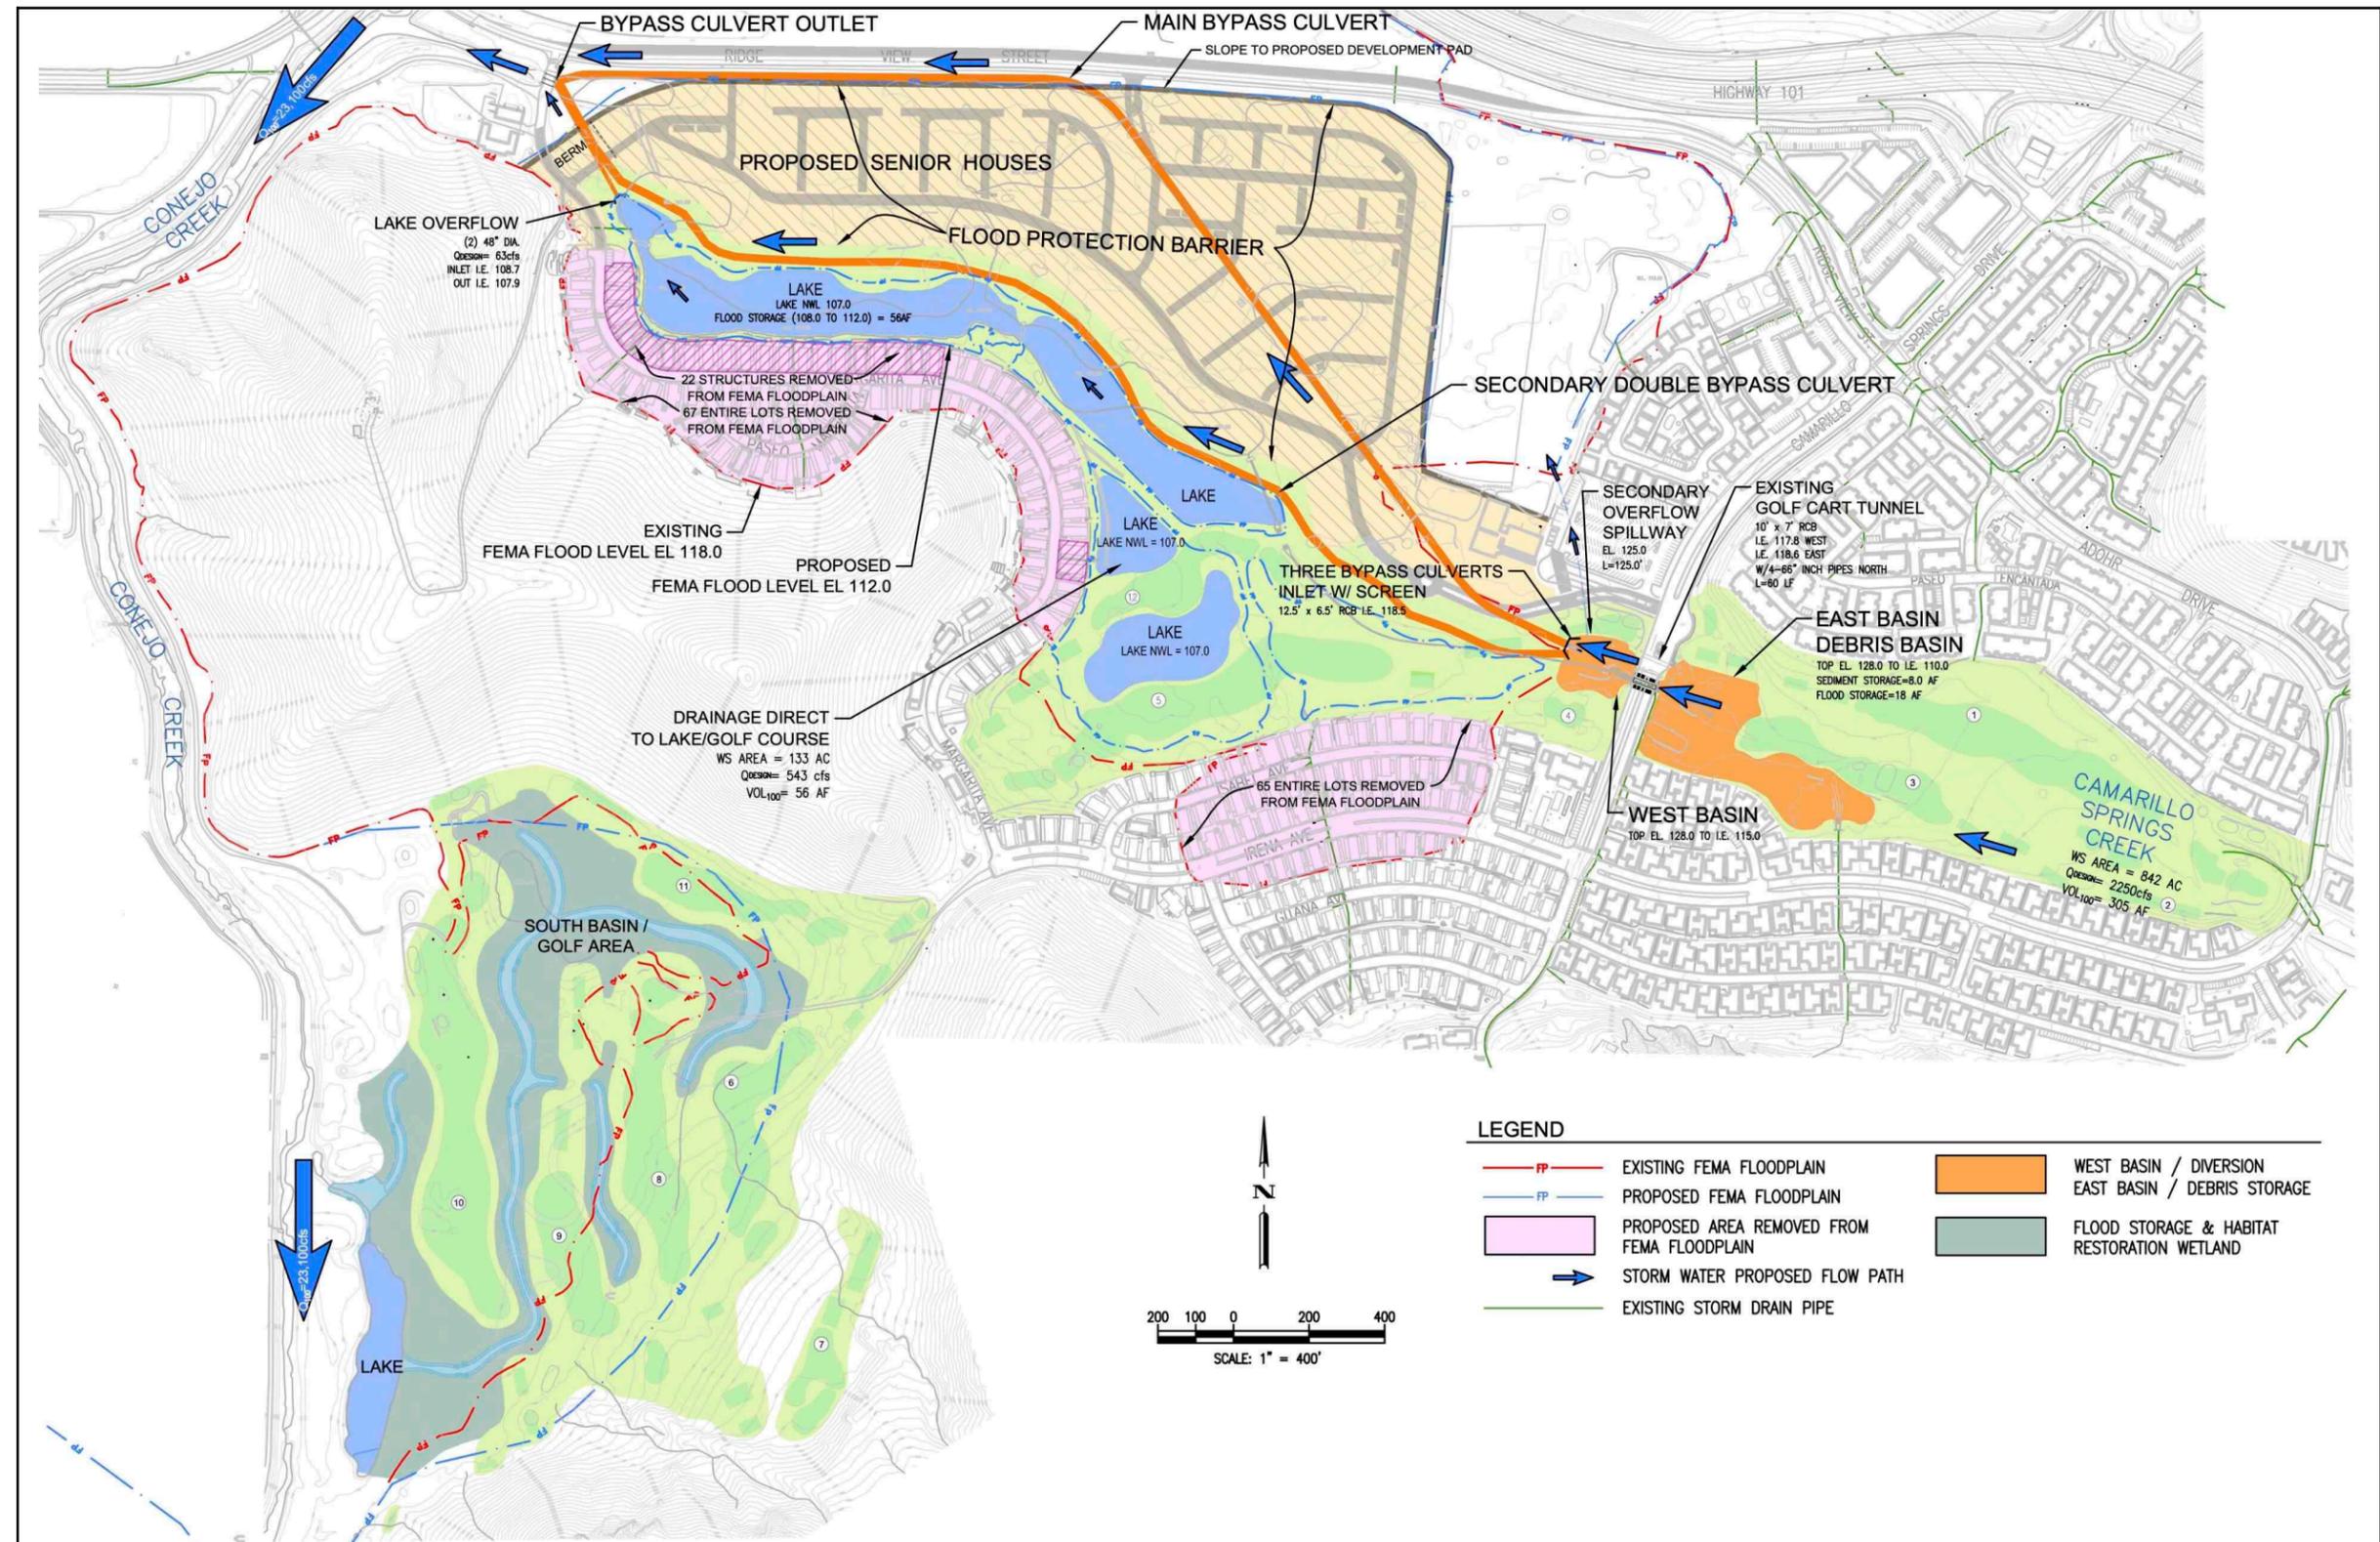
PROPOSED DEVELOPMENT PLAN
